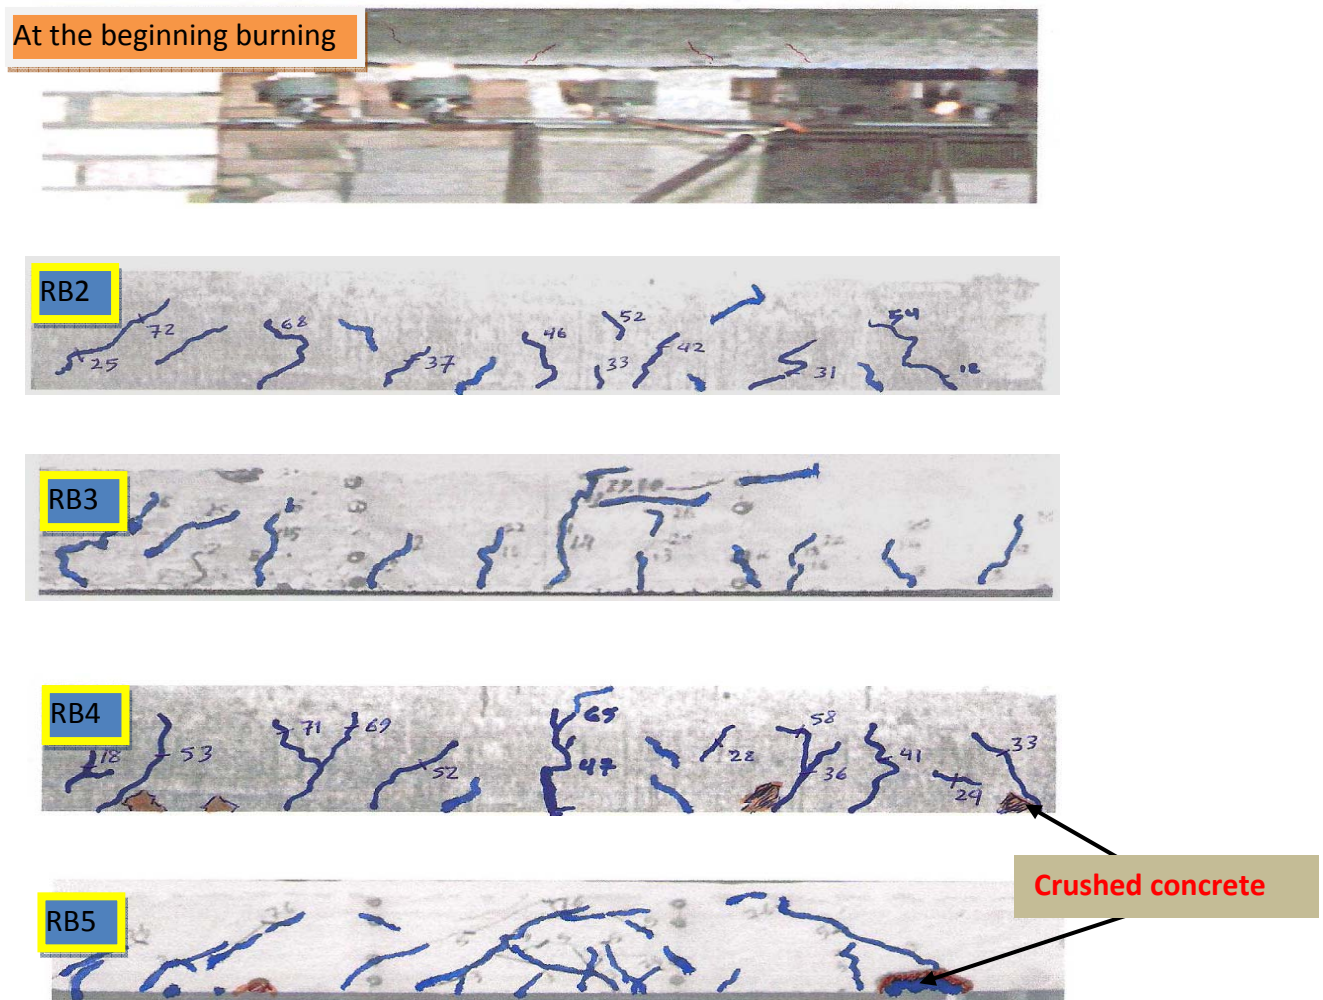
Typical crack pattern of rigid beam specimens before and after burning and subjected to loading.
